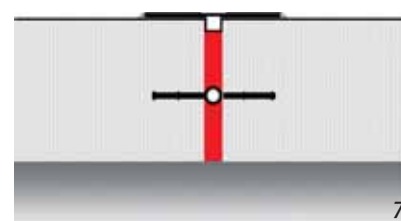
Waterproofing of a expansion joint by grout curtain injection
